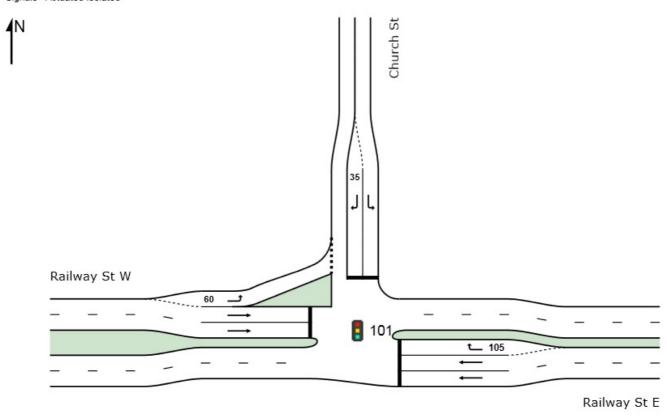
RAILWAY STREET AND CHURCH STREET INTERSECTION
